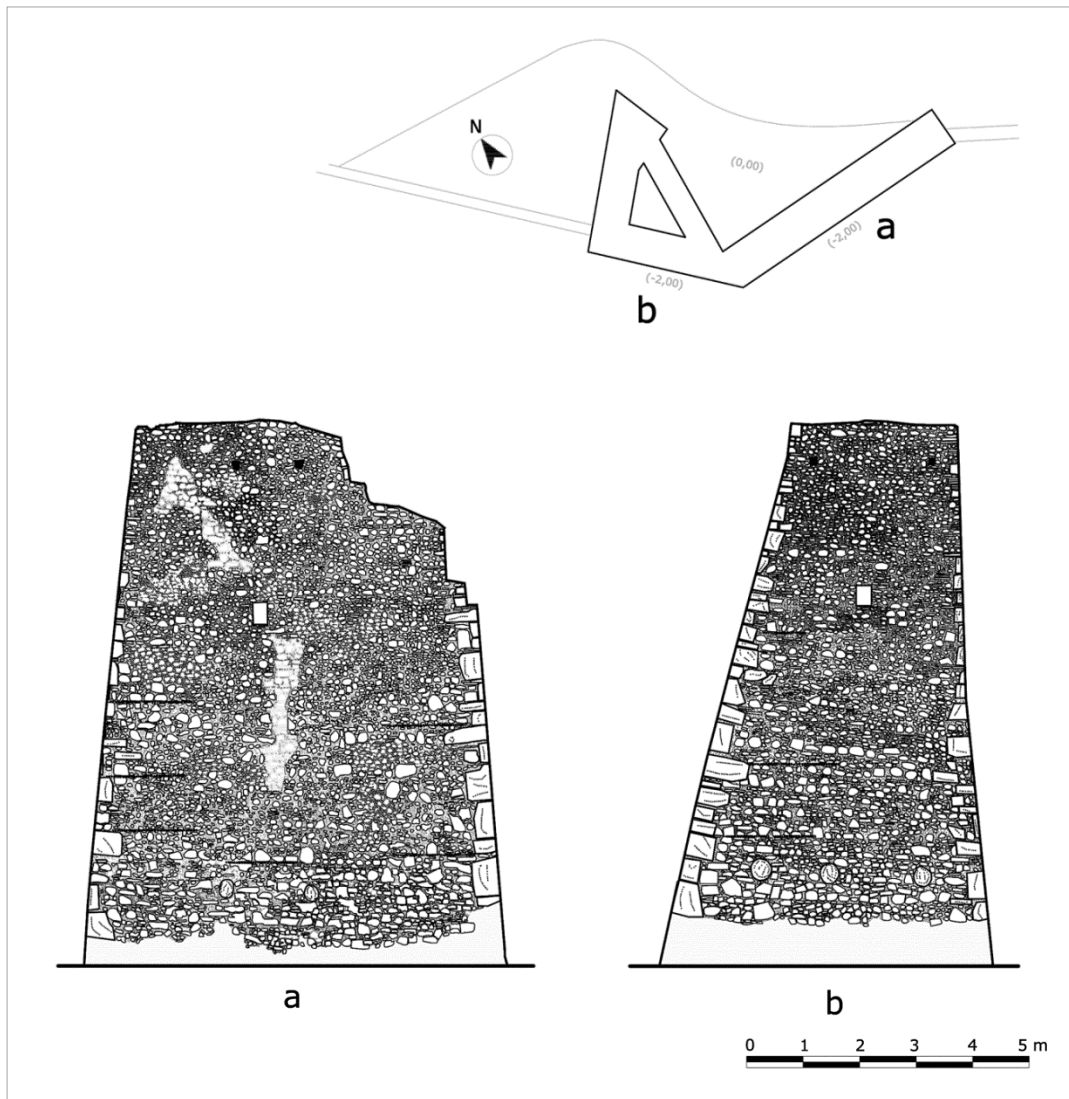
Benevento, urban walls, tower T8 (survey: L. D'Alessandro).
